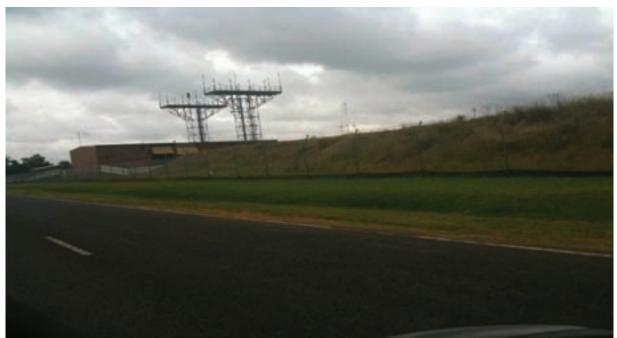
LOCATION B – Digit Street looking east (just east of the Cemetery) at the northern end of proposed 4000m Runway
